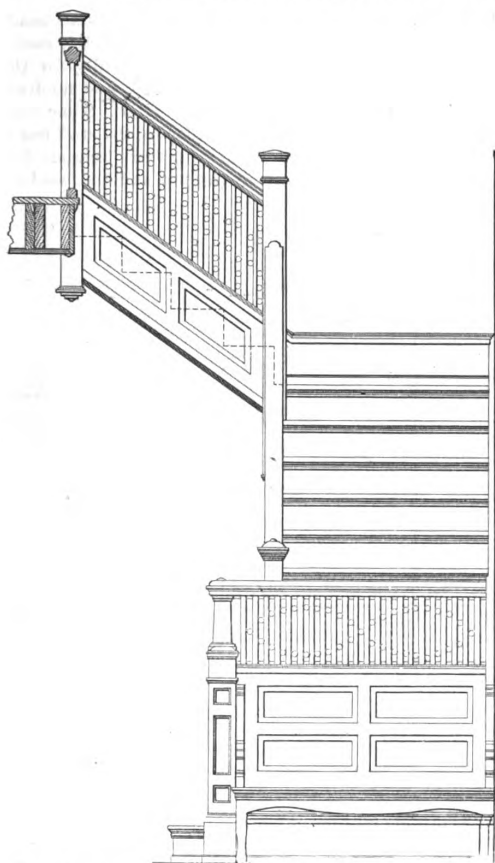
Elevation of Front Stairs Looking toward the Dining Room.—Scale, $\frac{3}{4}$ Inch to the Foot.
